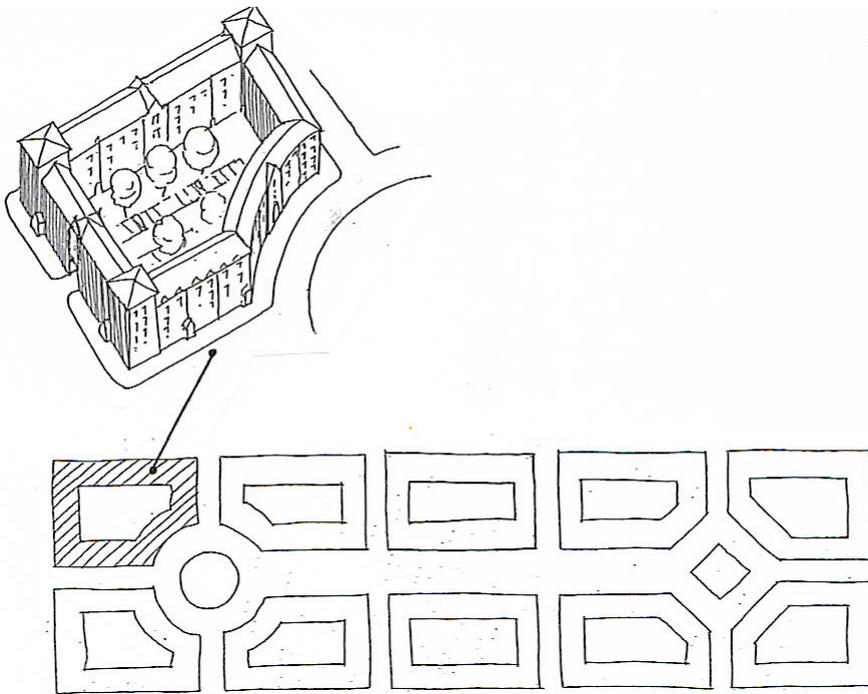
Typical arrangement of buildings placed around the perimeter of a street block to provide clear definition of public and private areas.
